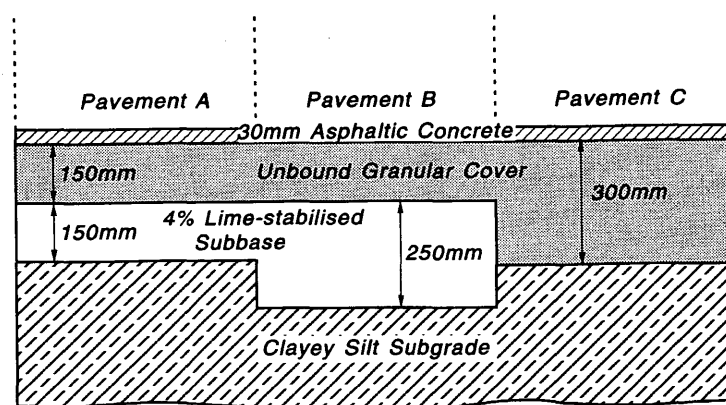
Cross section of pavements with lime-stabilized subbases.
